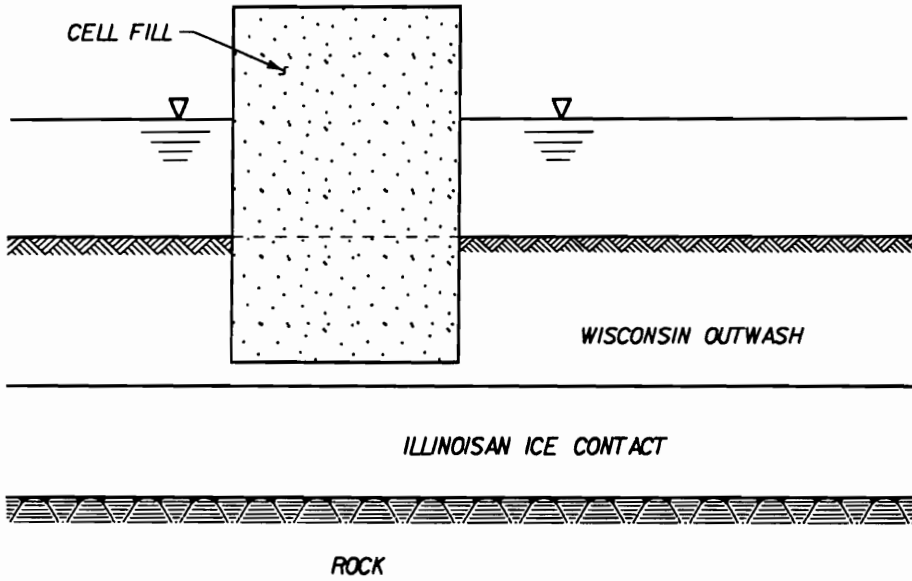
Profile section through the second-stage Lock and Dam No. 26(R) cofferdam.
